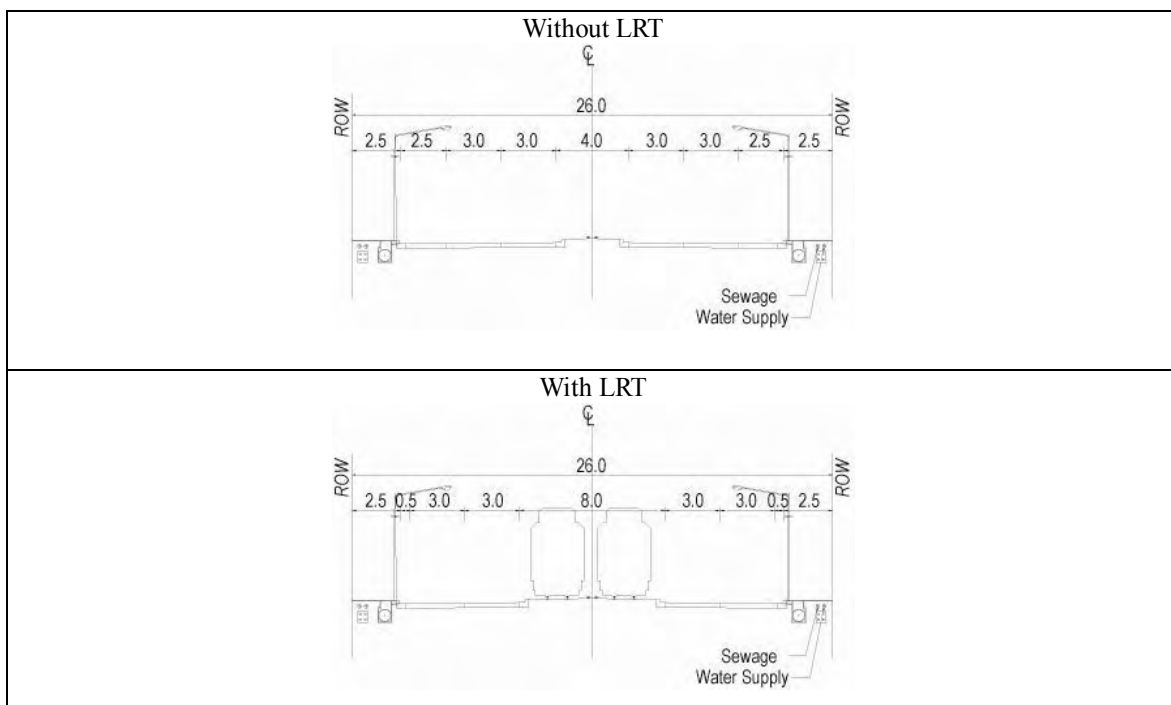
Typical Cross-section of a Secondary Road (Type E: ROW = 26m)
